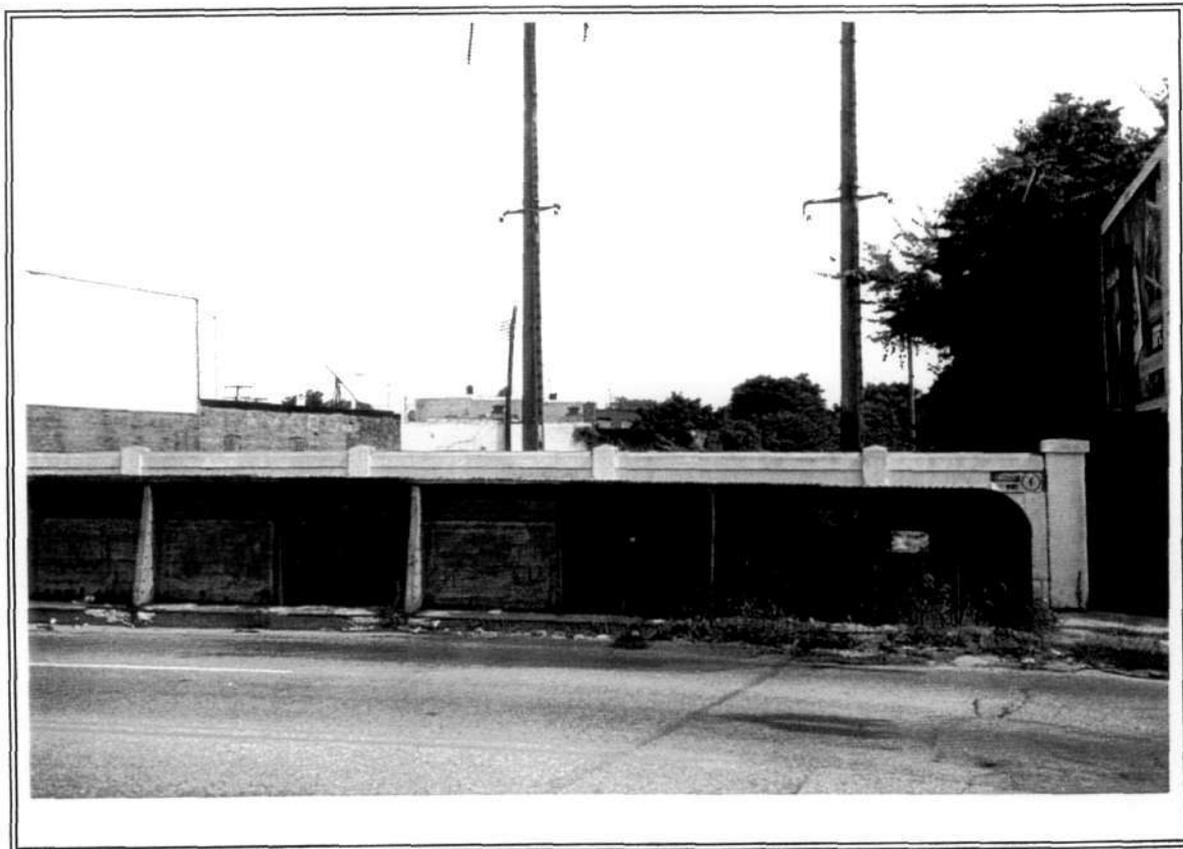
View from the southeast corner of the bridge, looking toward the north girder (#4)
